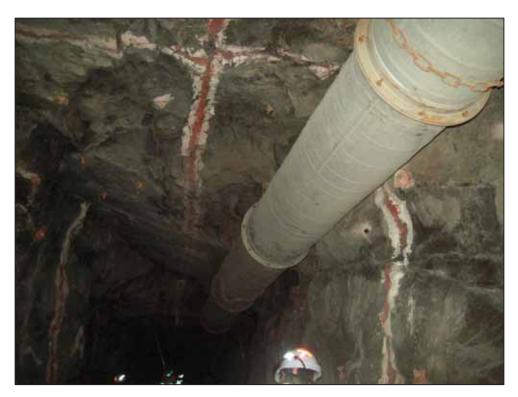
Development excavation greater than 2m high with poor hanging wall conditions and overhanging side wall (Mine 9)
